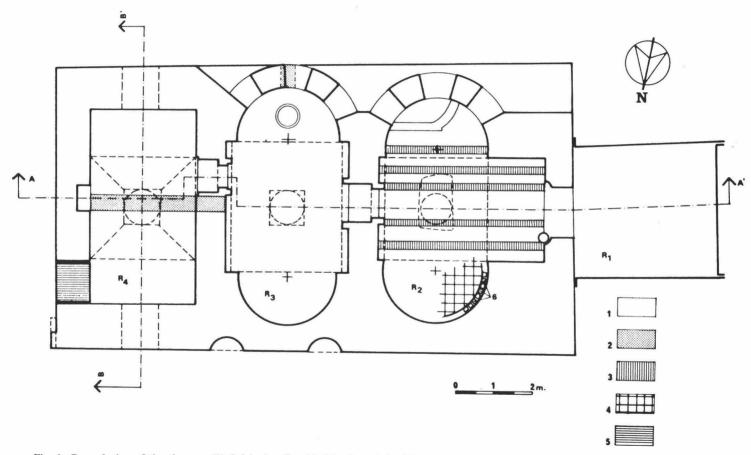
Ground plan of the thermae: (1) Original walls with Islamic-period additions; (2) Channel; (3) Suspensurae; (4) Floor of pottery tiles; (5) Blocked doorway; (6) Tubi.
